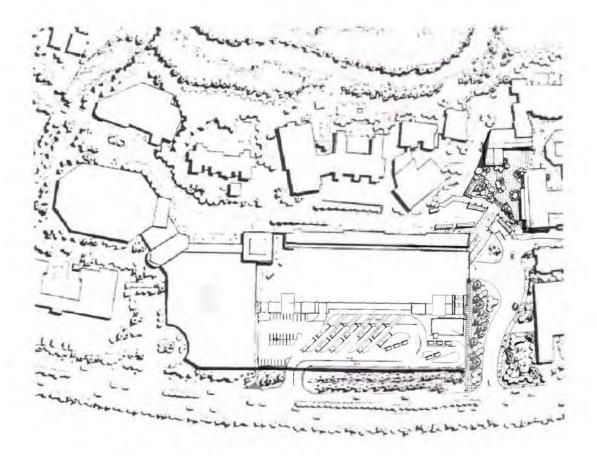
Lionshead Transit Center on top deck of Parking Structure
